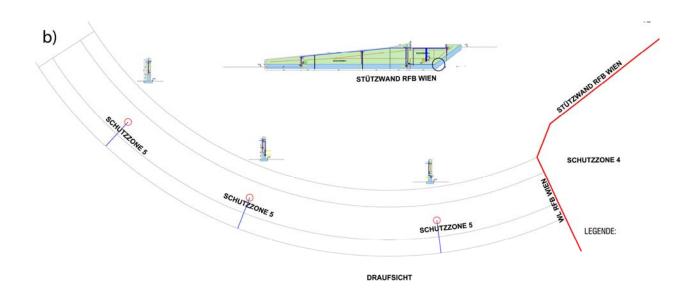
Schematic representation of the CP protection zones & anode systems: B2136, abutment and sustaining wall – zone 4, three bridge columns – zone 5.
